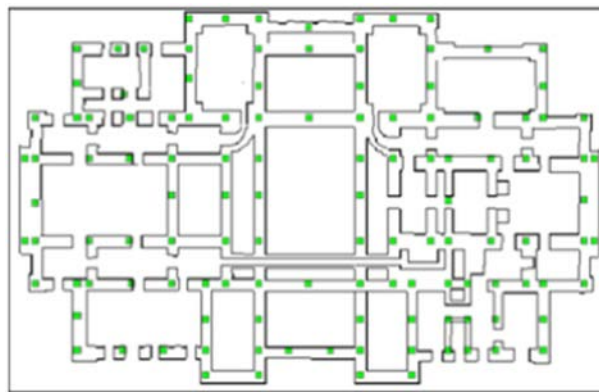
Proposed locations of high damping rubber bearings on foundation.
